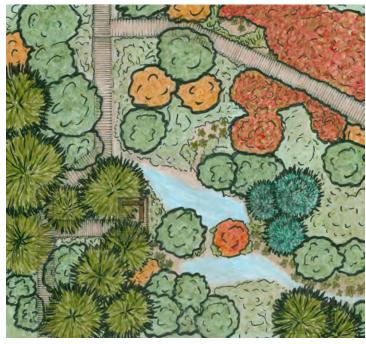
Site plan for viewing blind 1 (VB1) (Hanson 2012)
